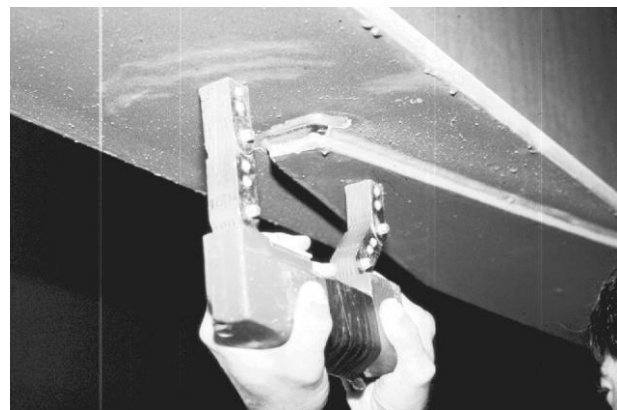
Magnetic particle testing of welded cover plate terminations
